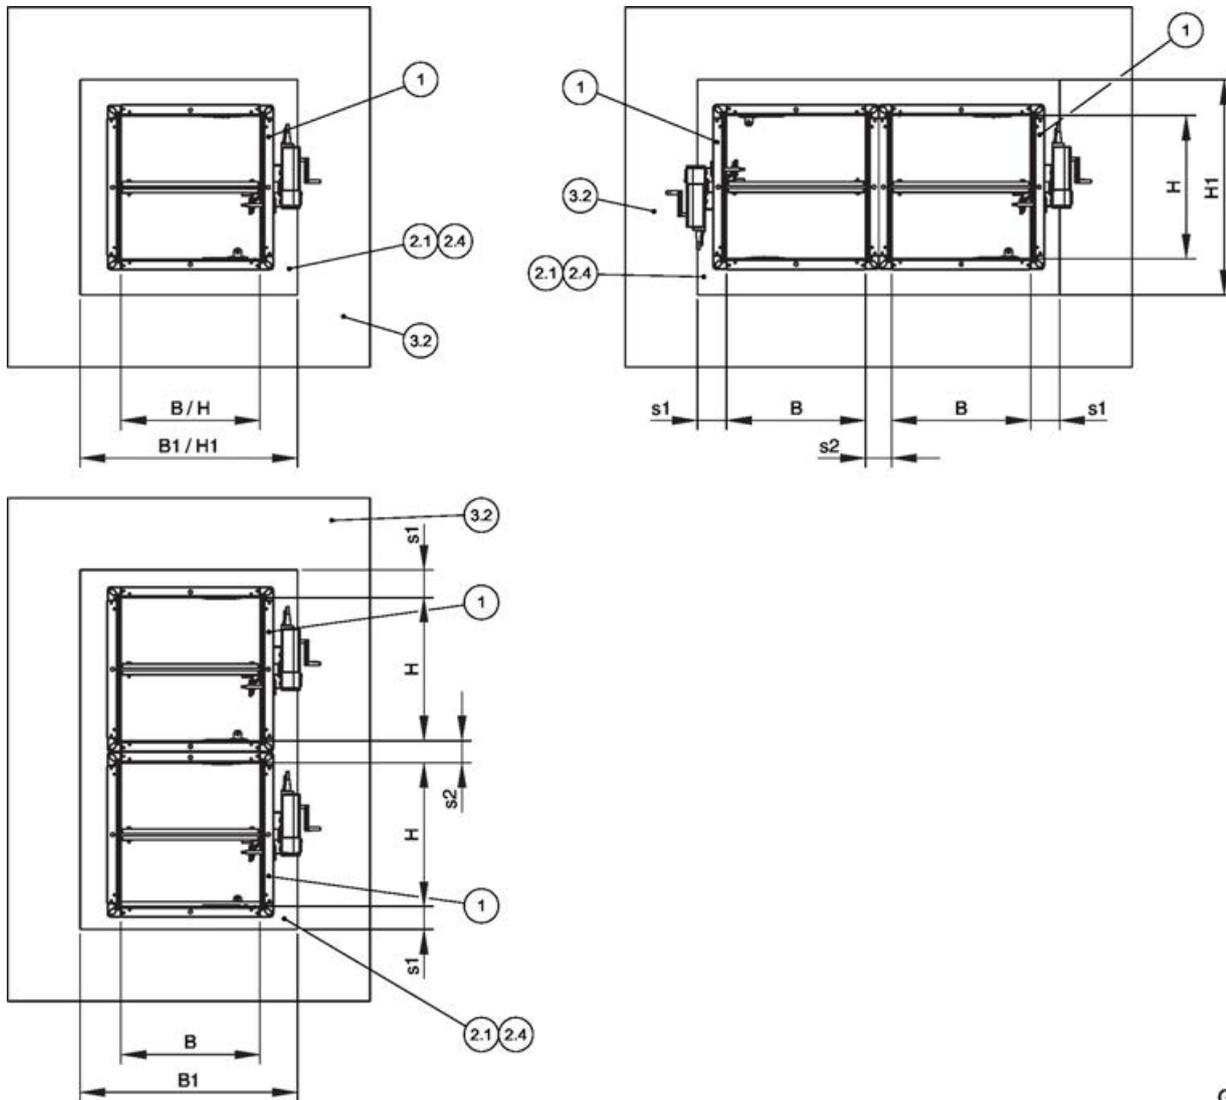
Dry mortarless installation remote from solid walls with installation kit WE (wall penetration)
